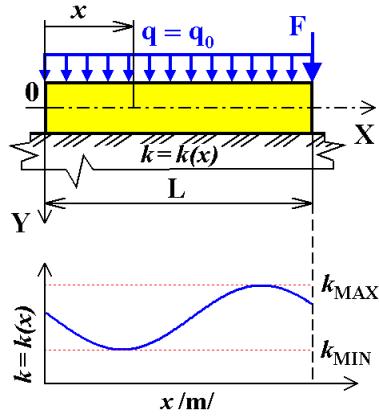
Example 2 (beam on elastic foundation loaded by force F and distributed loading q).
